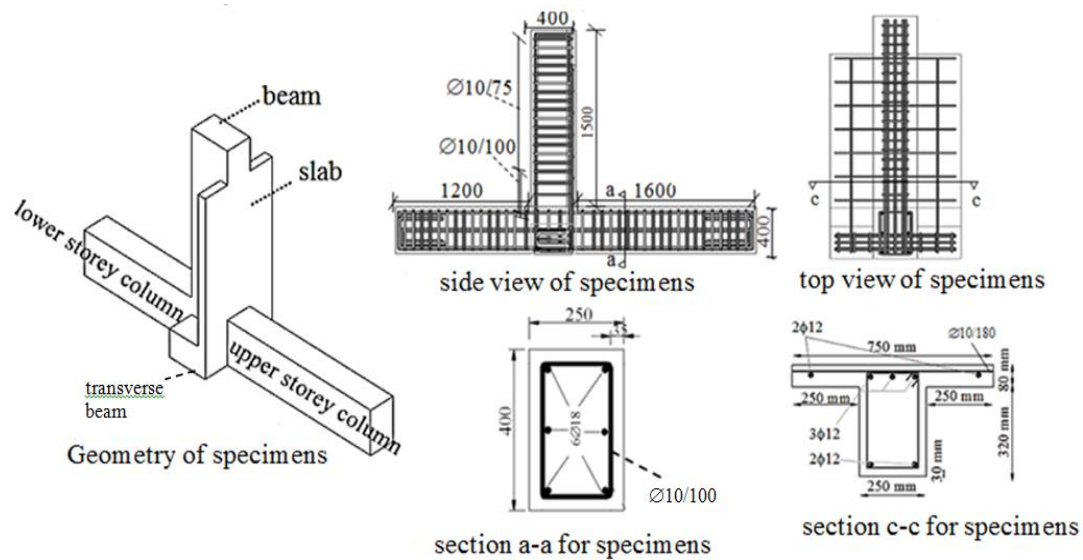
Geometry and reinforcement details of specimens (units in mm).
